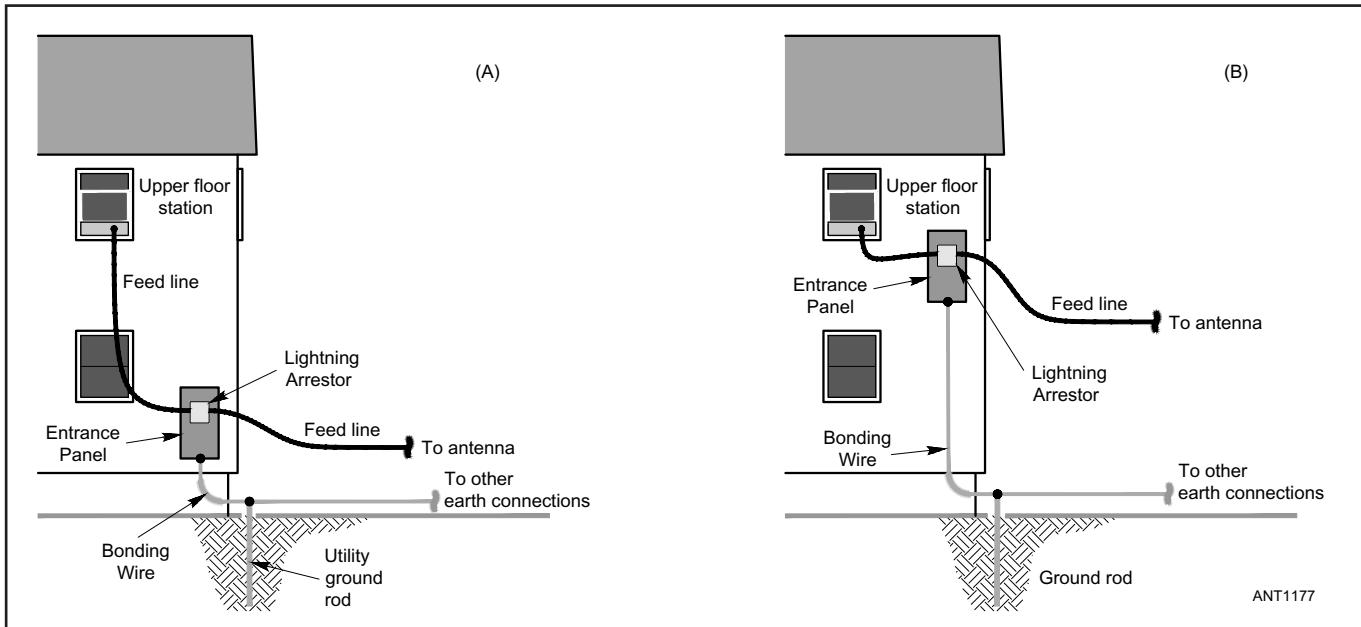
Protecting an upper-floor station against lightning is a challenge. If possible, construct an entrance panel at ground level as in A and run feed lines (and a ground wire – not shown) to the station. If the entrance panel must be at the station level as in B, it should still be grounded but the long bonding wire will create significant voltages at the station. Disconnecting all cables when not in use on when storms are nearby is highly recommended in this case.
